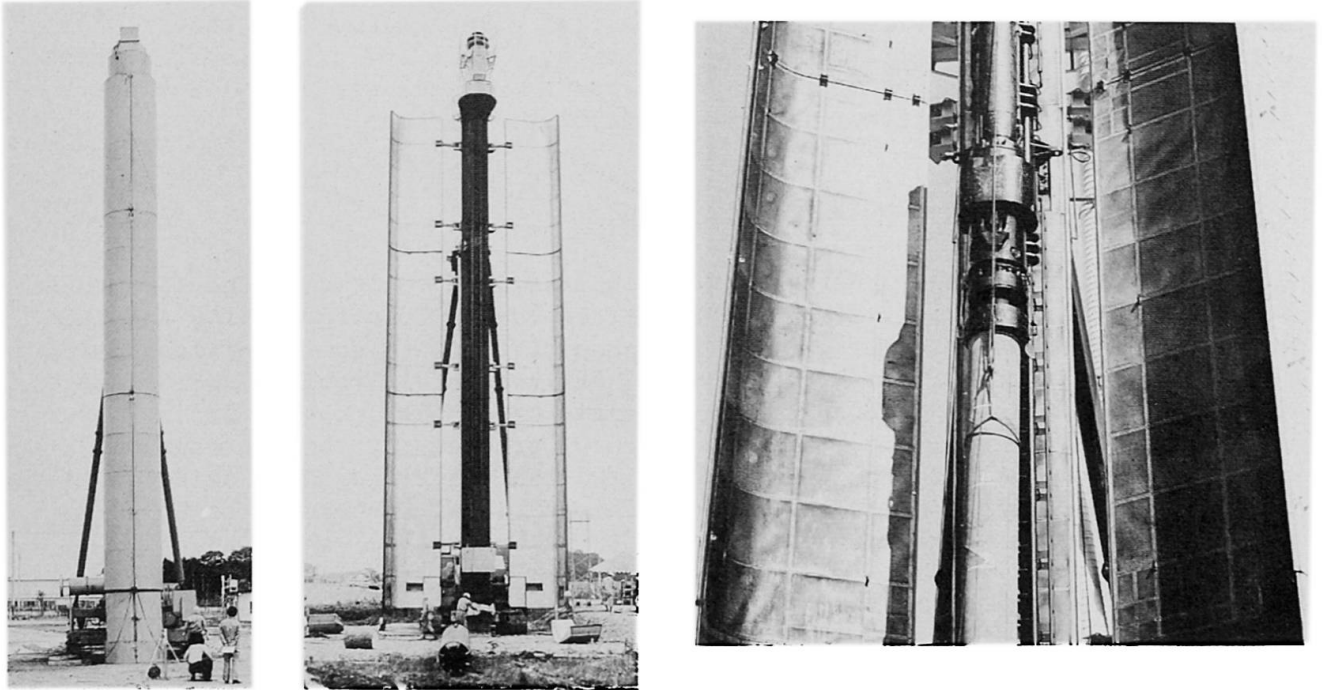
Noise-Reducing Cover for Pile Driving Rig (Photo courtesy of the Japan Association for Steel Pipe Piles)
